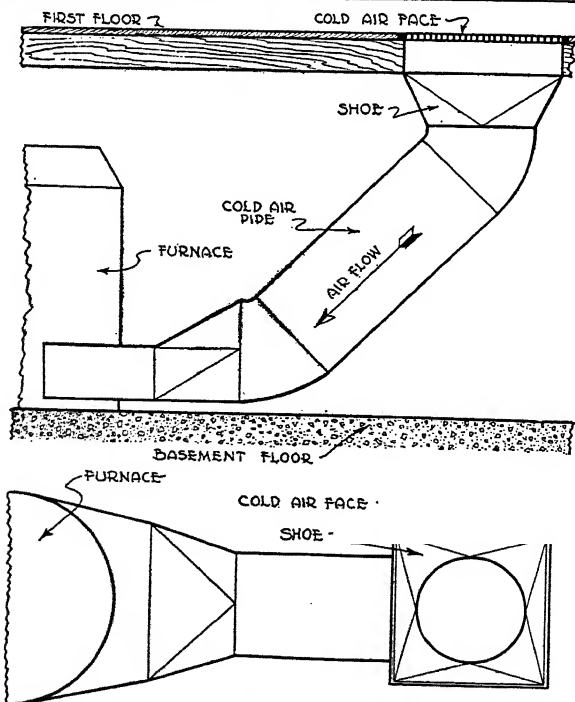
Plan and Elevation of Recirculating Duct and Shoe
